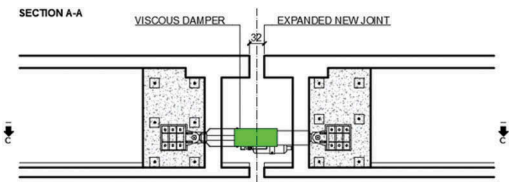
Project configuration: overview of deck vertical section - Installation of viscous damper between the joints expanded up to 32 cm.
